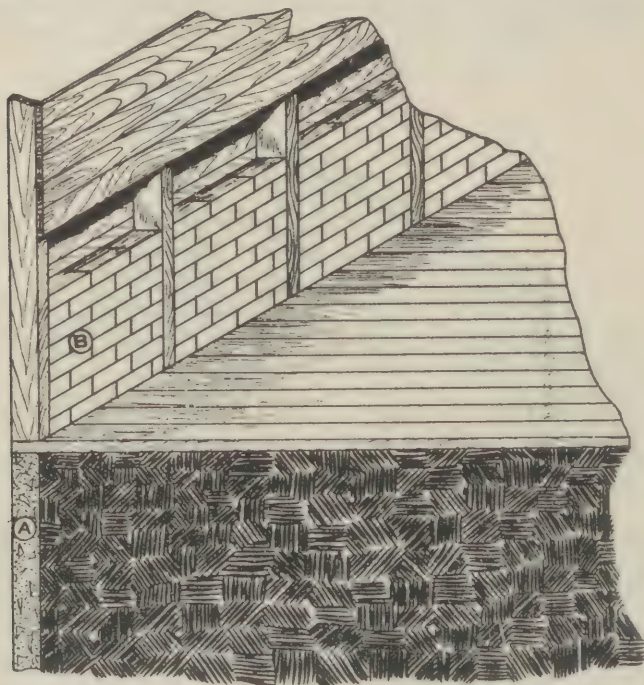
(Schematic). Method of rat proofing by: A—Concrete foundation wall; B—Closure of openings between studding with brick.
